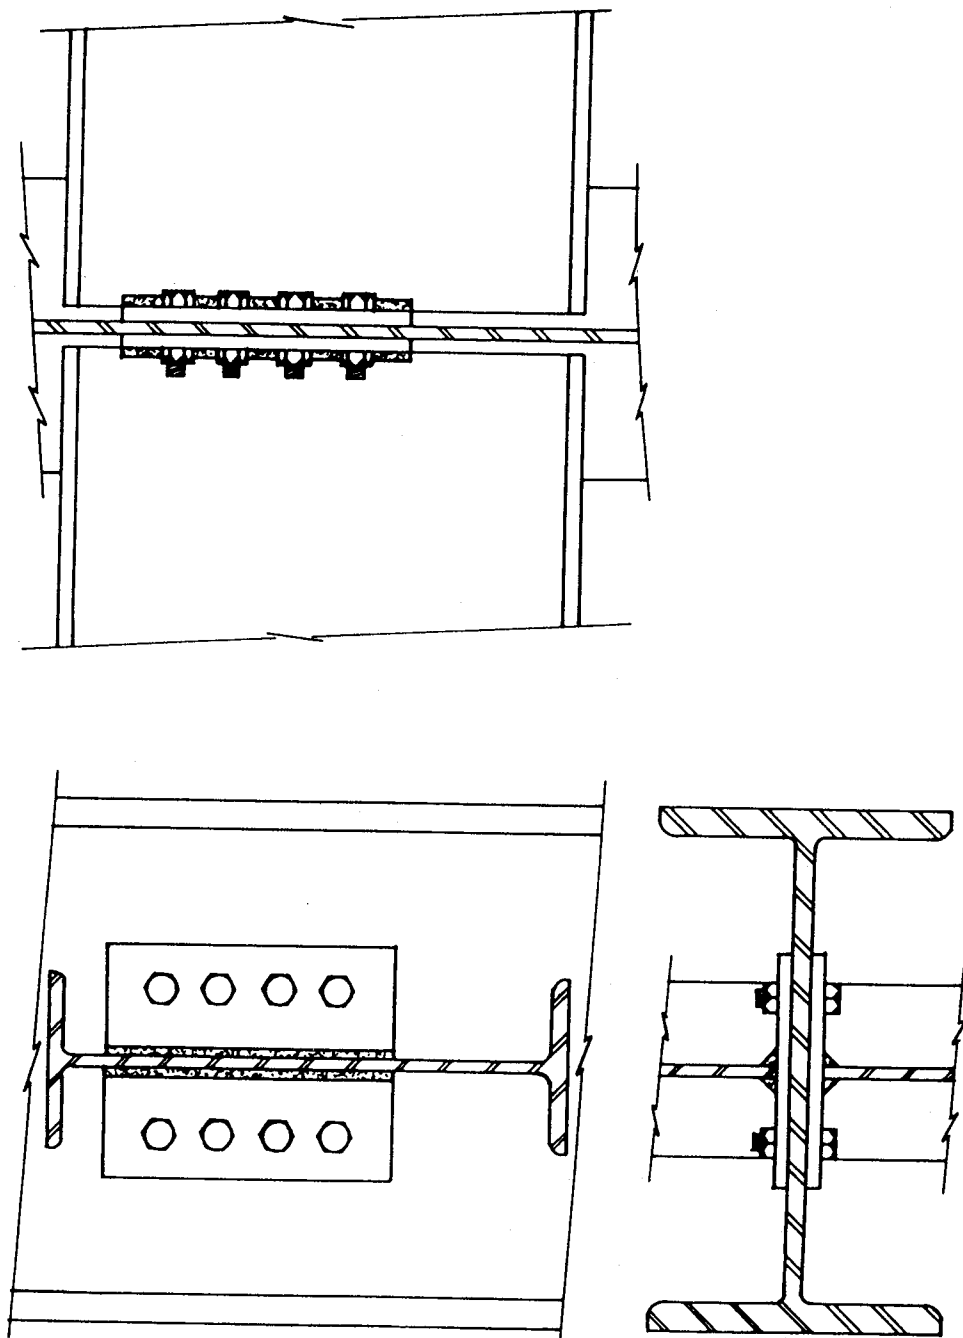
Double Flexible End Plate Connection to Column Web Detail
